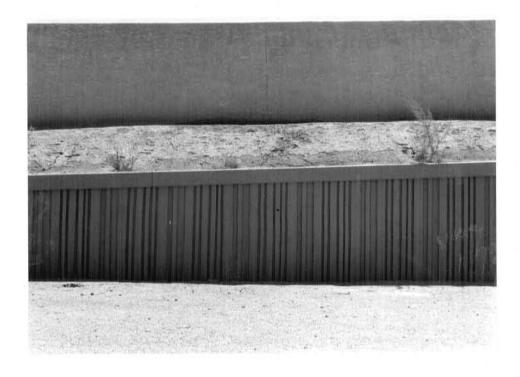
Hilfiker Wall at the Warner Road Interchange.
